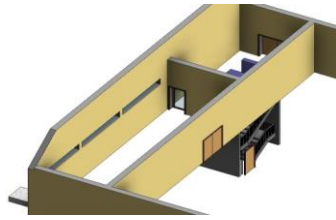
Proposed plans for multipurpose activity room, one element that pertains to the extension.
